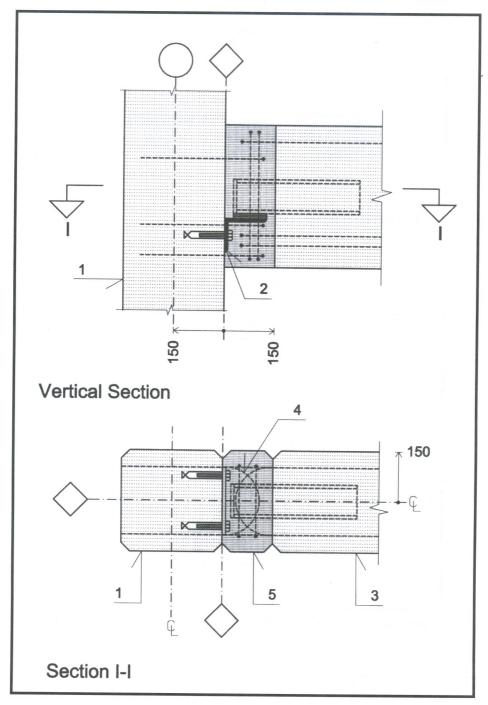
Column/Beam Connection With Temporary Steel Section Supports
